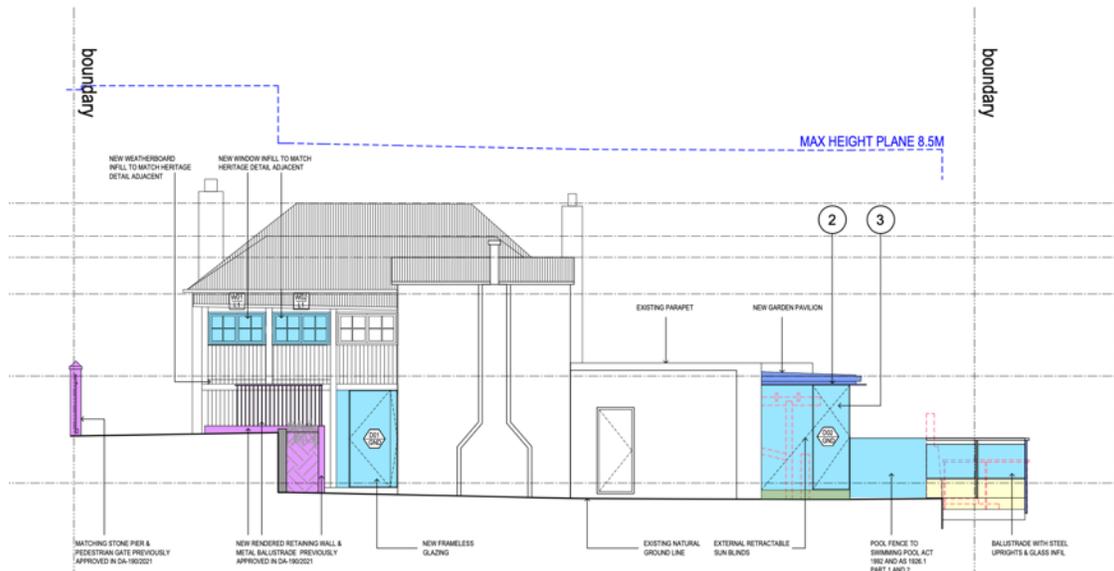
, Proposed North Elevation, Michael Cumming Architect, 24.02.23
